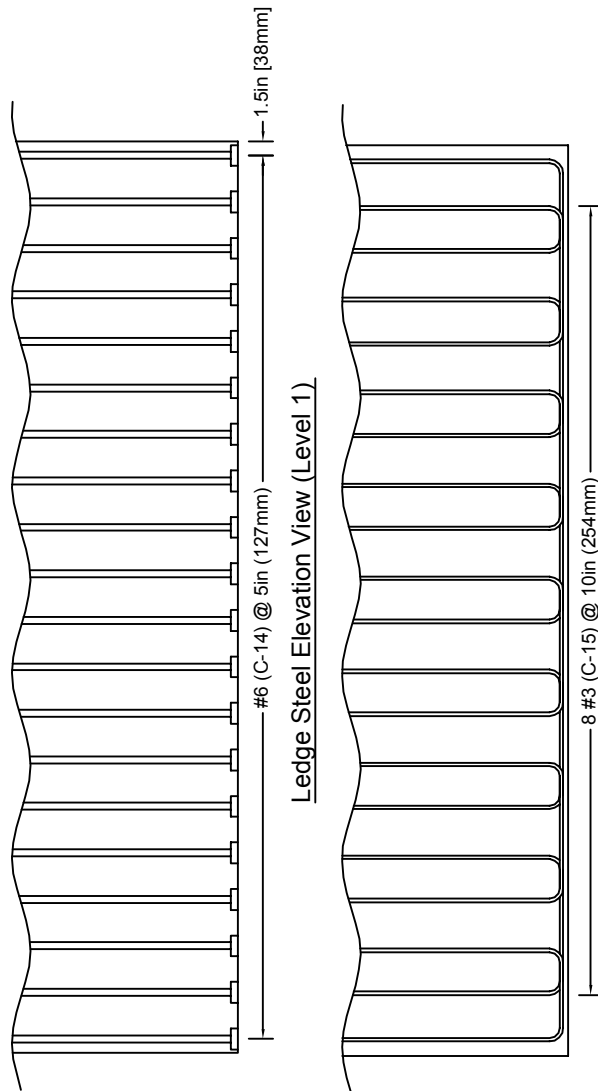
Bridge Plans Sheet 6; Bent 1&3 Ledge Reinforcement.
